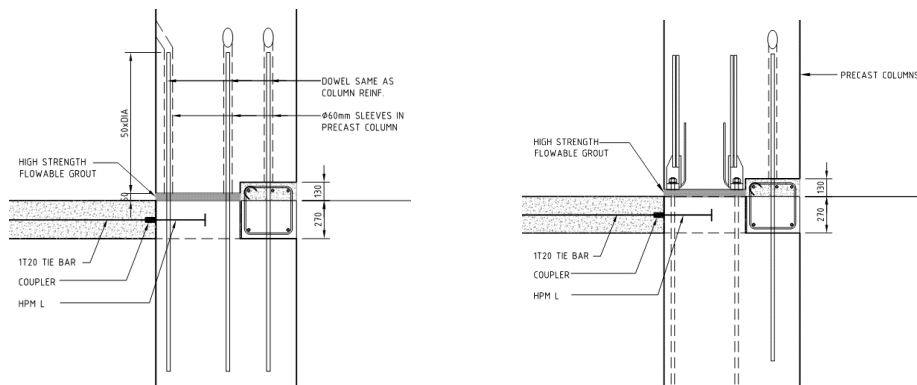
A Place To – Columns splice and ring beam support, to the left a traditional propped doweled solution and to the right a Peikko solution un-propped © BG&E / Peikko / A Place To
